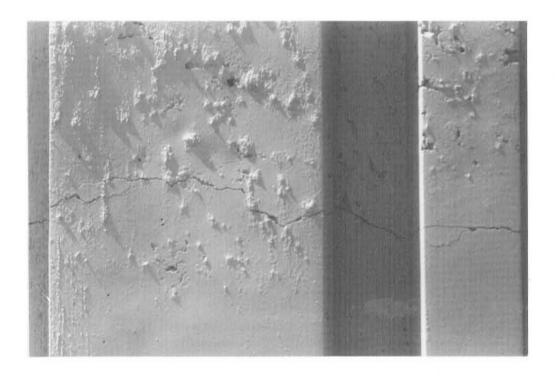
Air Voids and Horizontal Cracks in the Concrete Panels.
